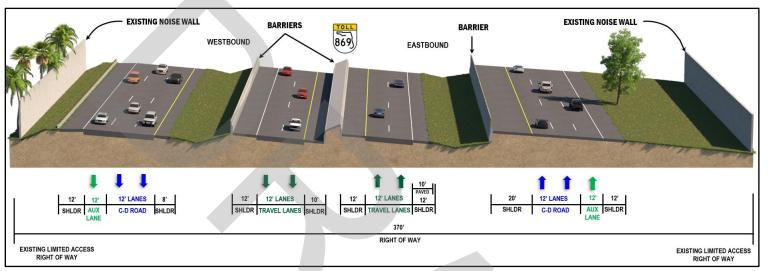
No-Build Alternative Sawgrass Expressway Roadway Section between Lyons Road and Florida's Turnpike
